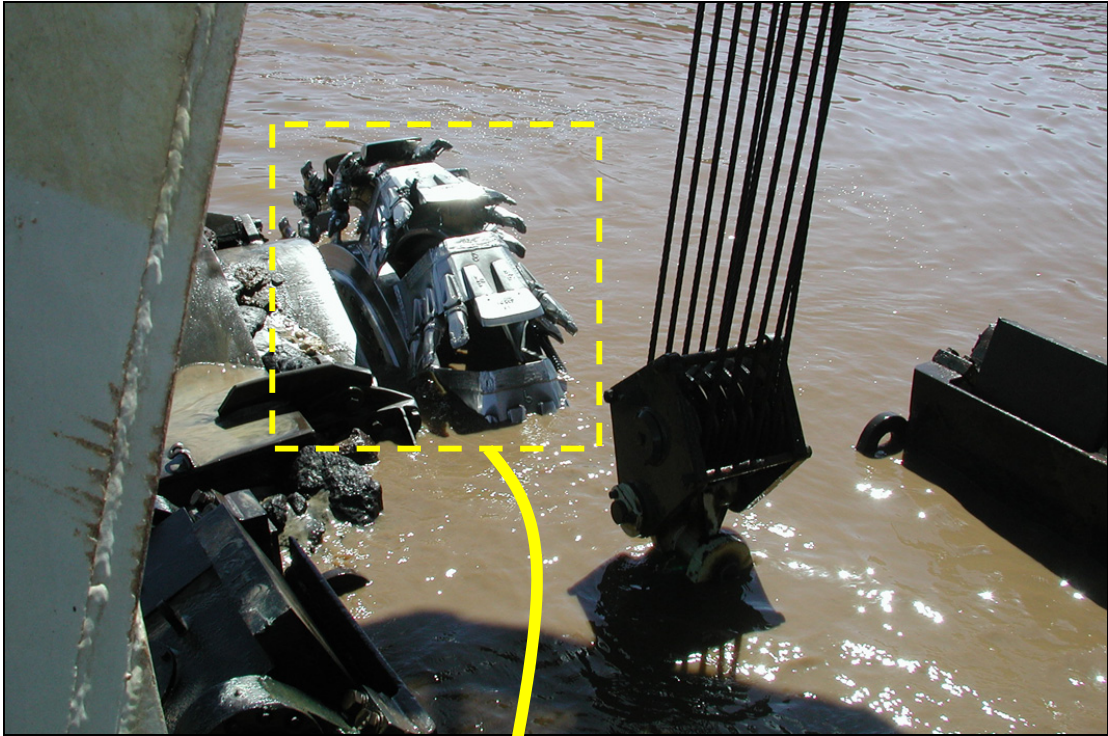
Typical suction-cutter dredge head (shown in the raised position)
